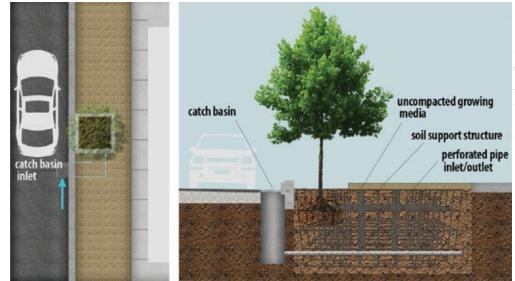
Cross section of tree box with a structural support system under the sidewalk.
